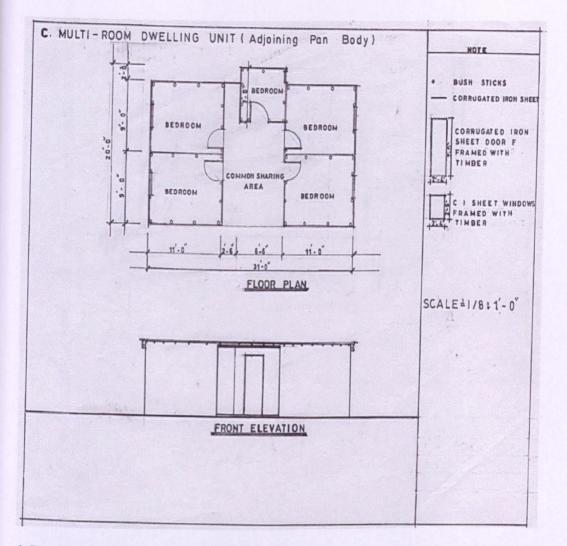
Floor plans showing layout of dwelling units in informal settlements.
